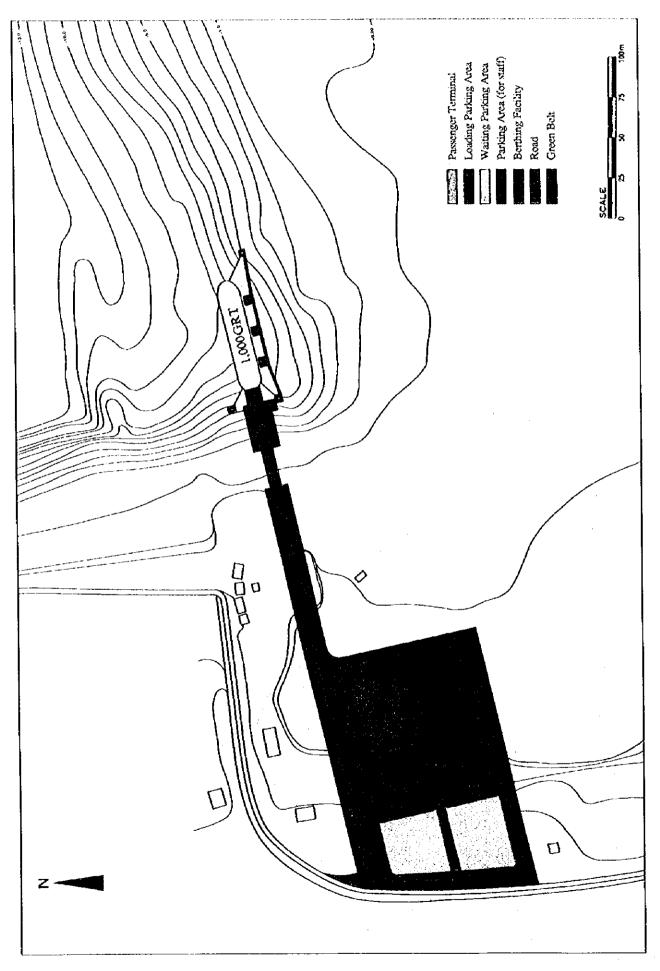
Layout Plan of Wahai Ferry Terminal
